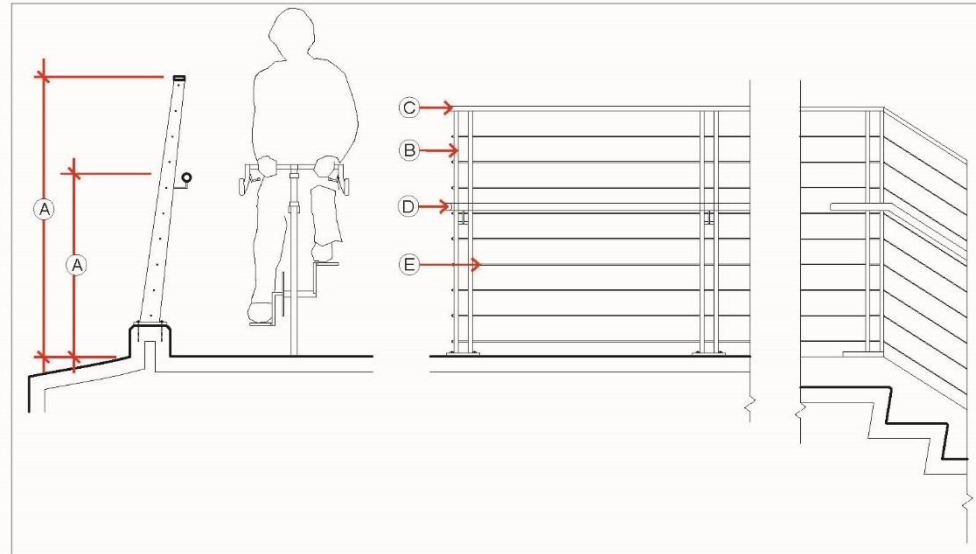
Pedestrian railing type 2 typical section and elevations
